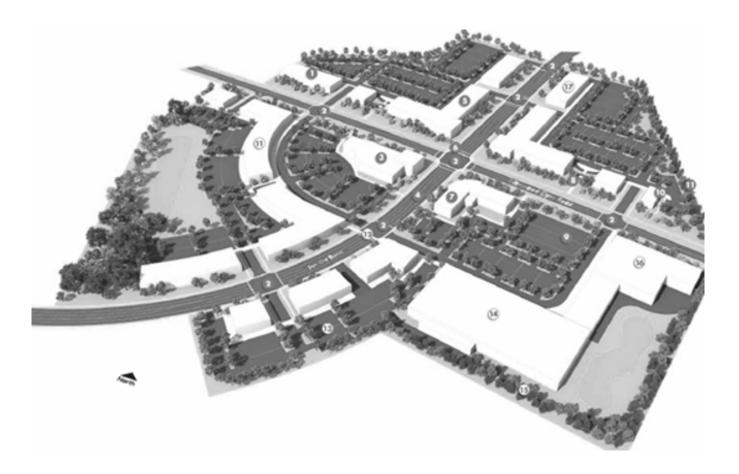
The Village of Lynwood's Comprehensive Plan, adopted in 2014, supports the extension of Joe Orr Road and calls for a proposed Town Center at the new intersection of Joe Orr Road and Glenwood Dyer Road. The plan envisions the Town Center to serve retail, office, and civic uses, including the relocation of Village Hall to the intersection.
